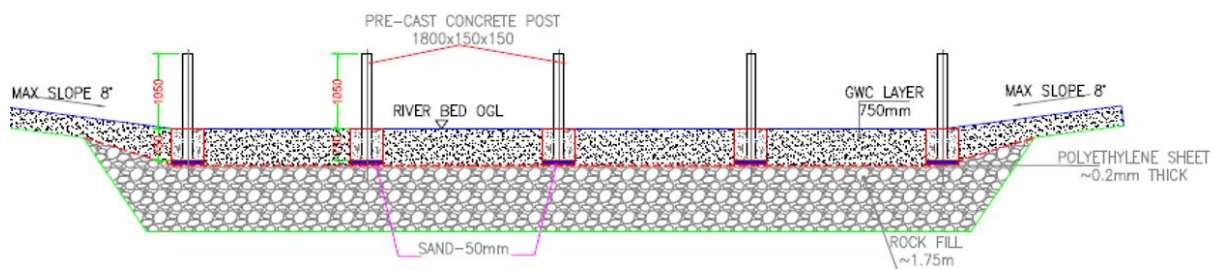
A typical Concrete drift section with rock fill, which permits subterranean flow.
